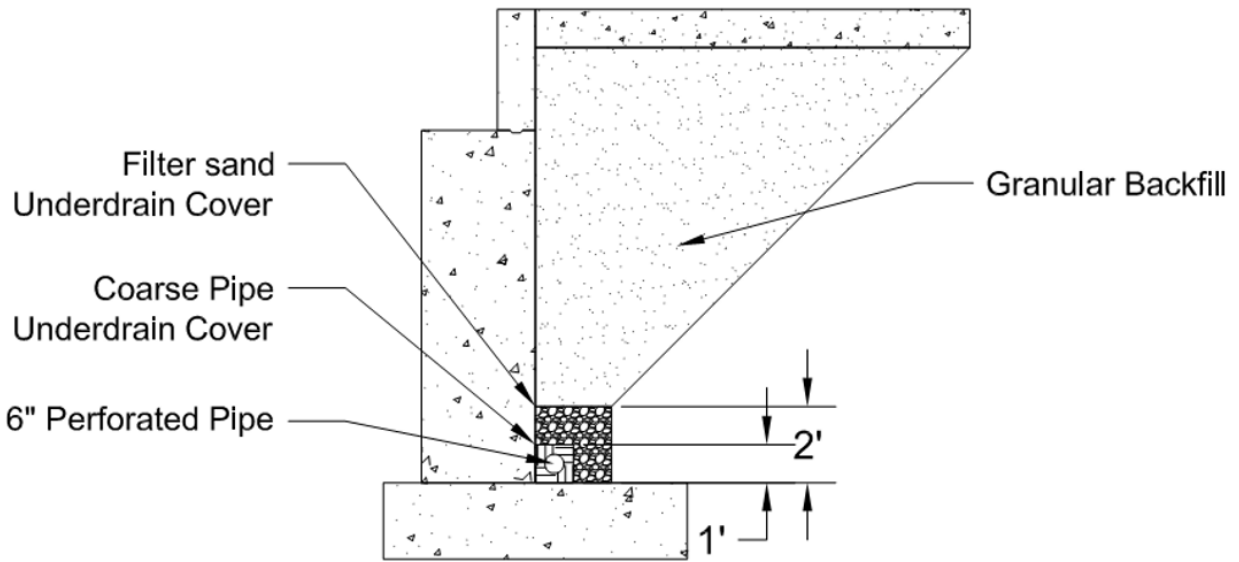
Underdrain Design, After ODOT Proposed Plan for Tecumseh Road over I-35
